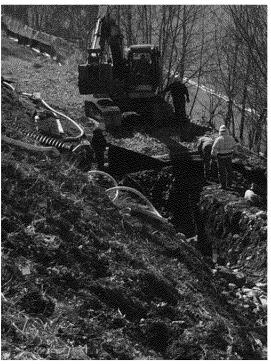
; Taken on 02/24/14 at 13:45 hours by START GN. Laying out HDPE liner to install in trench.
